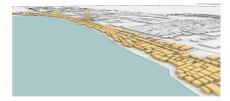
Site Plan of Kampung Muara Baru showing existing kampungs, commercial and factory buildings and site conditions Drawing by author
